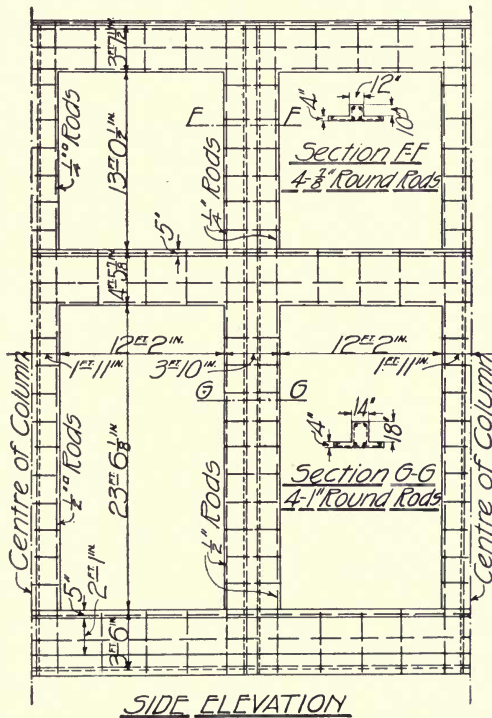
Side Elevation of the Bullock Machine Shop. (See p. 89.)
